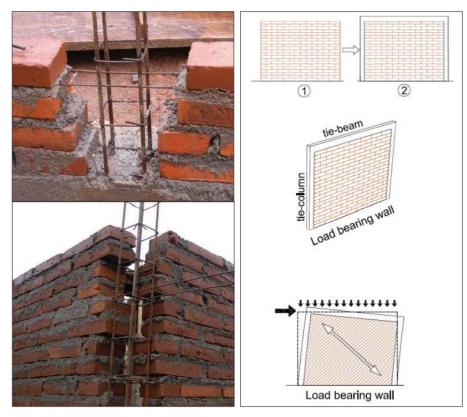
Tsunami and Seismic resistant masonry wall design (American Samoa Government, 2011)
